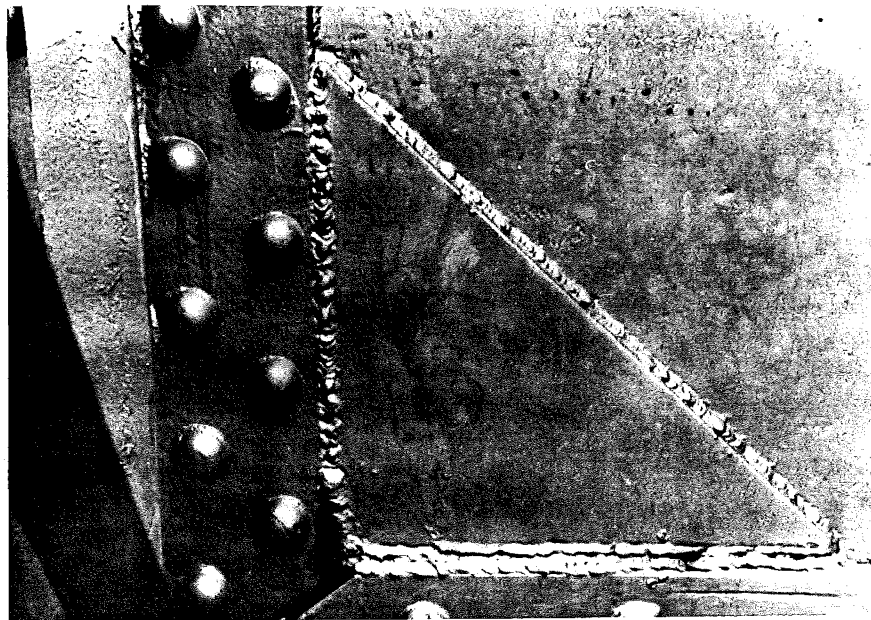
Welded Reinforcement at Cracked Web Gap
